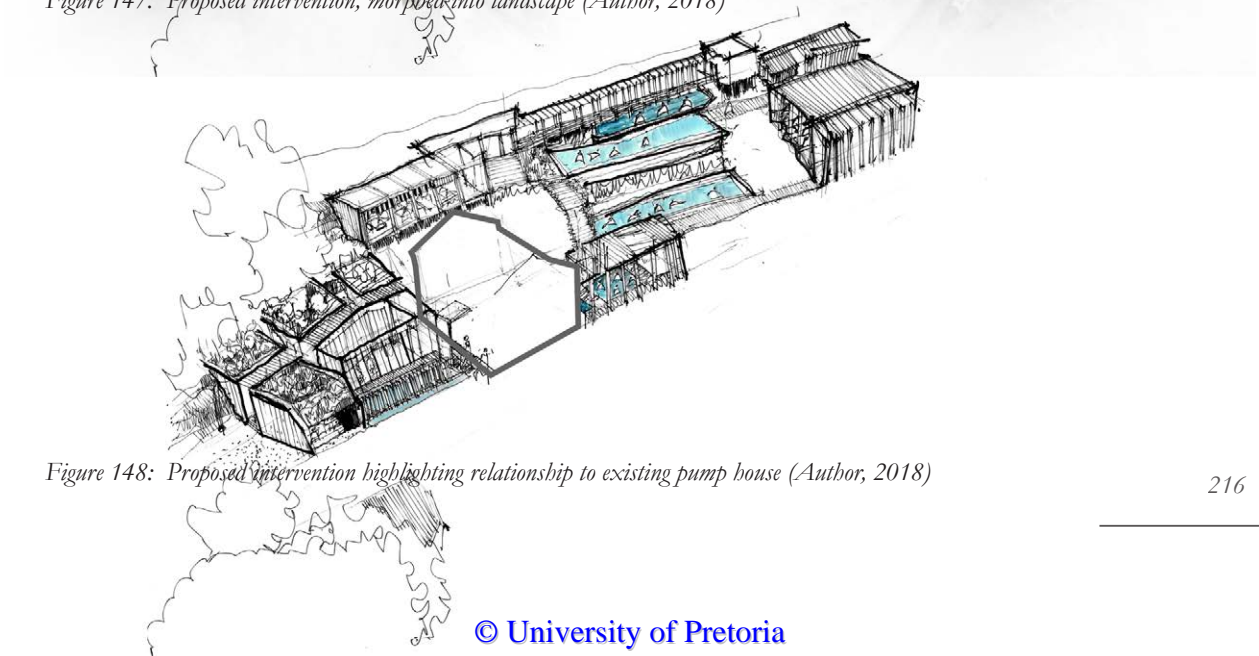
Proposed intervention highlighting relationship to existing pump house (Author, 2018)
